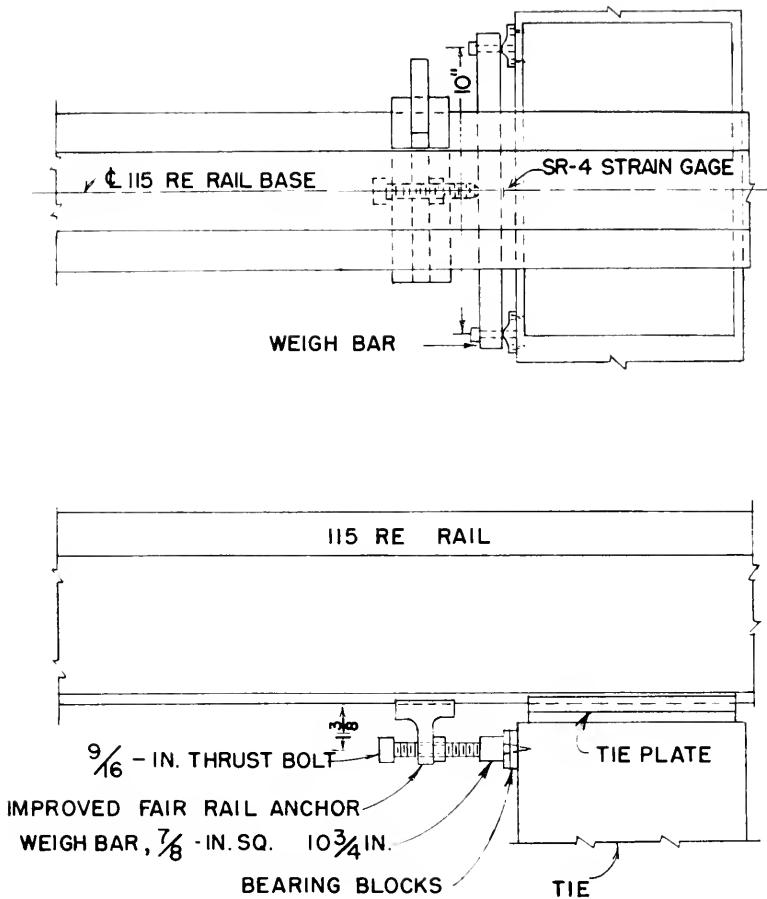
PLAN OF WEIGH BAR FOR MEASURING RAIL RESTRAINING FORCES
